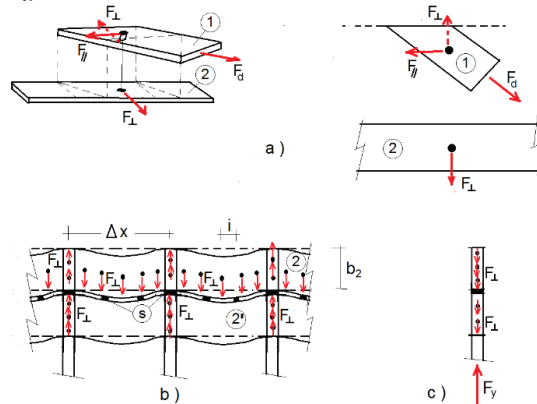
Portion of the diaphragm with the joist perpendicular to the edge: actions in the nailed connection (a) in the lower existing plank (b) and in the joist (c)
